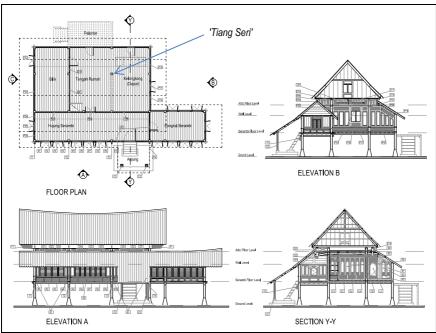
Decorative Ornament Carving Placement in Layout Floor Plan, Elevation A, B and Section Y-Y of Lanjong House.
